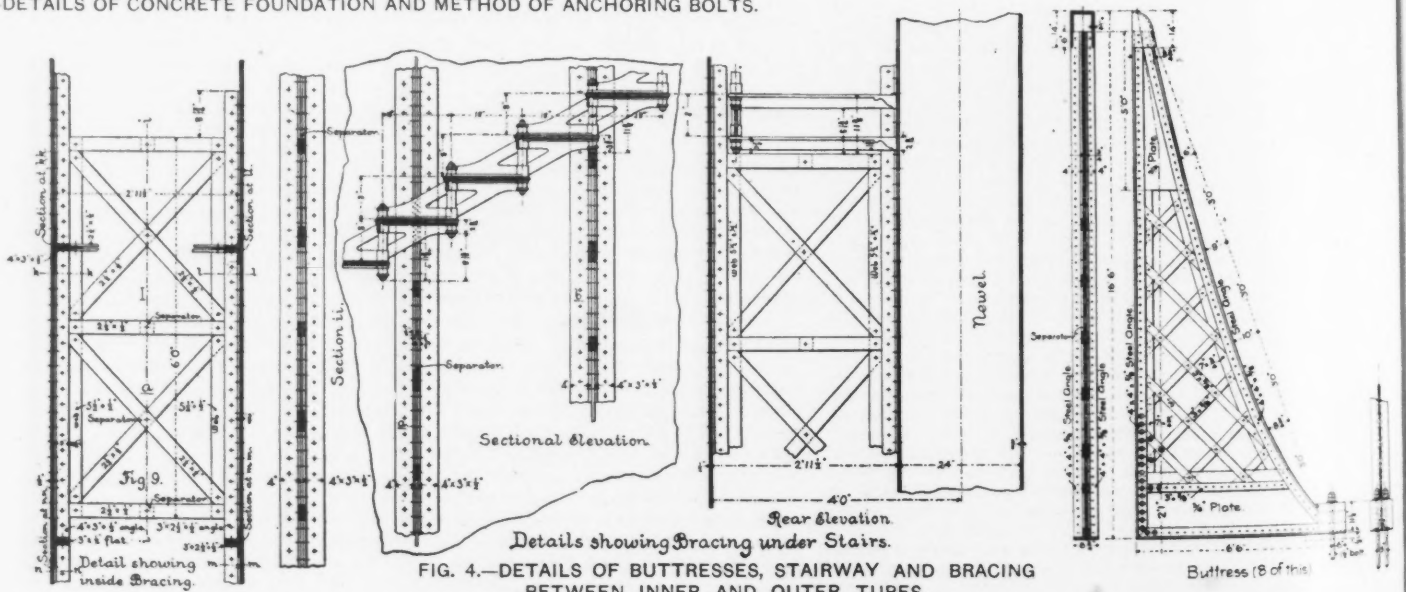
DETAILS OF BUTTRESSES, STAIRWAY AND BRACING BETWEEN INNER AND OUTER TUBES.
